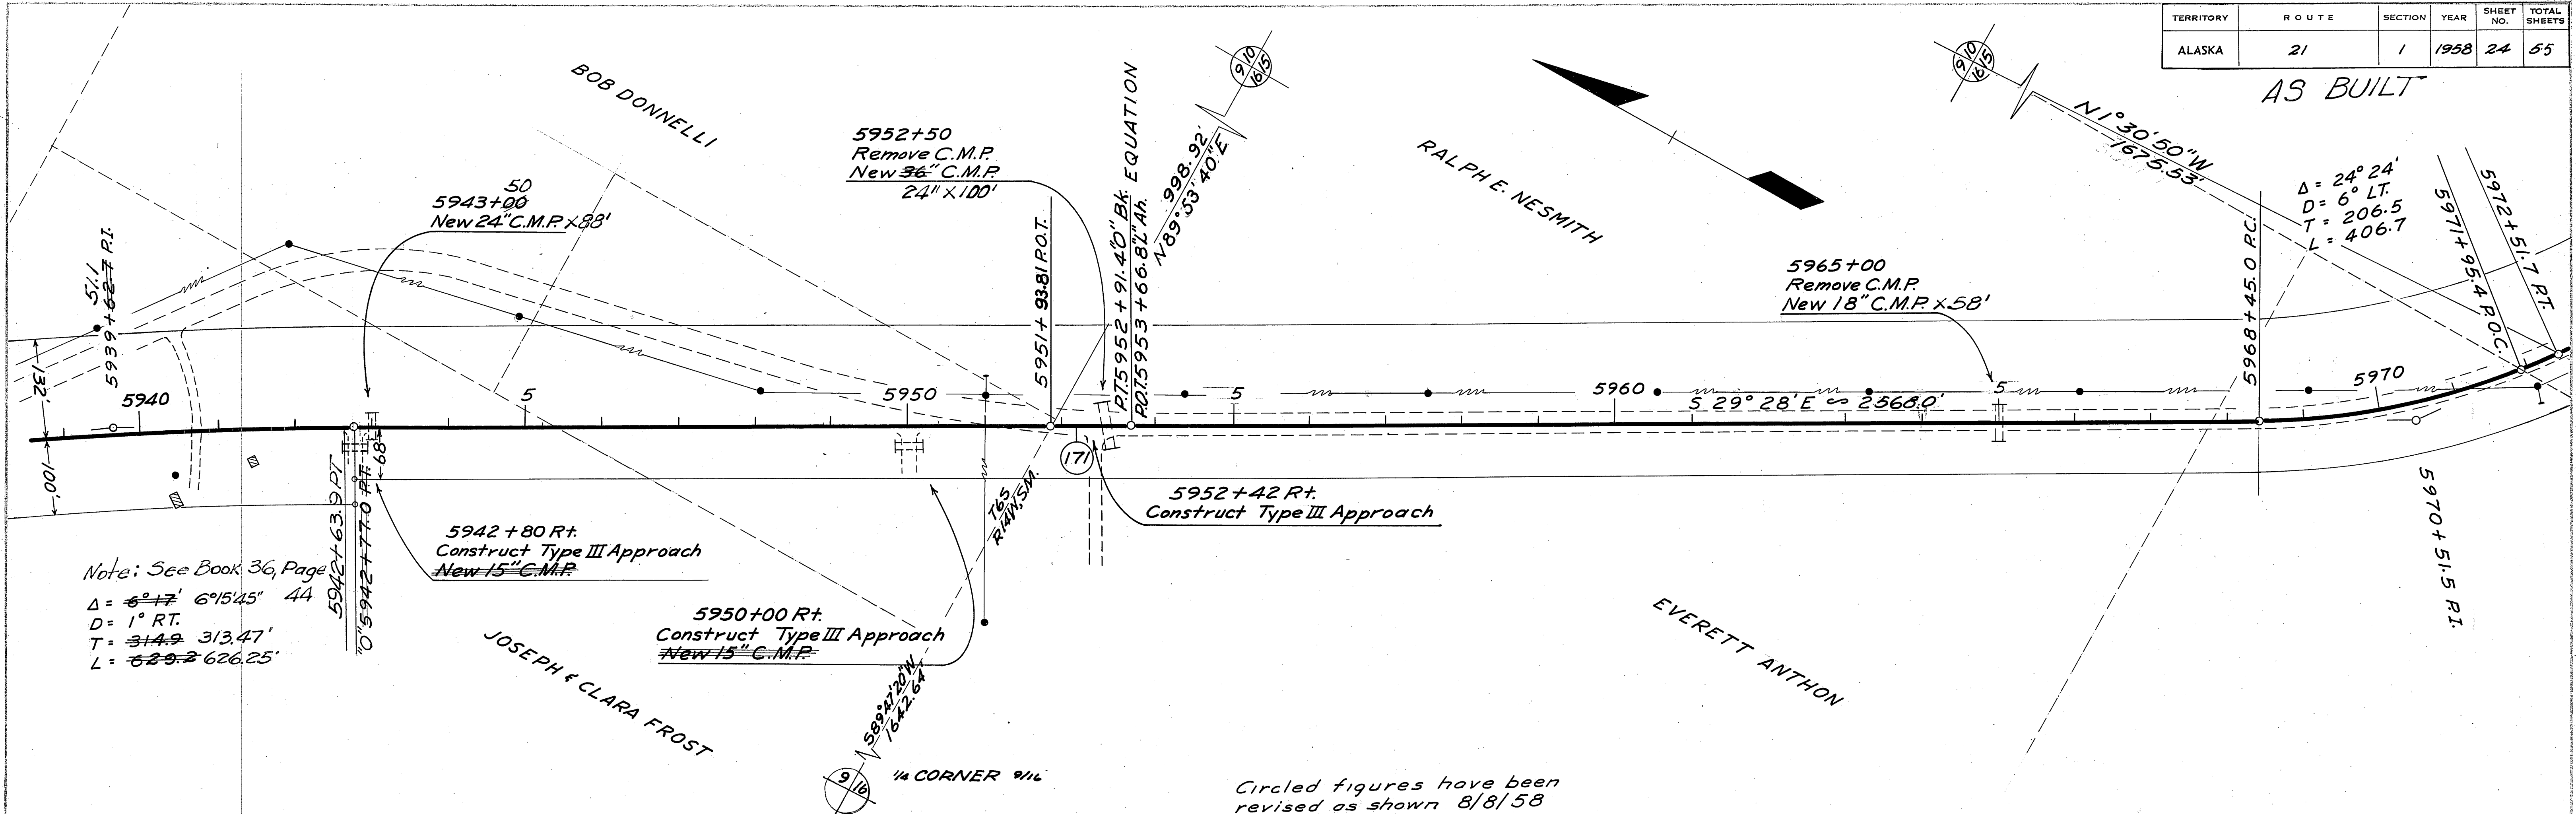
PLAN - PROFILE - O. P. R. & N. E. STANDARD
